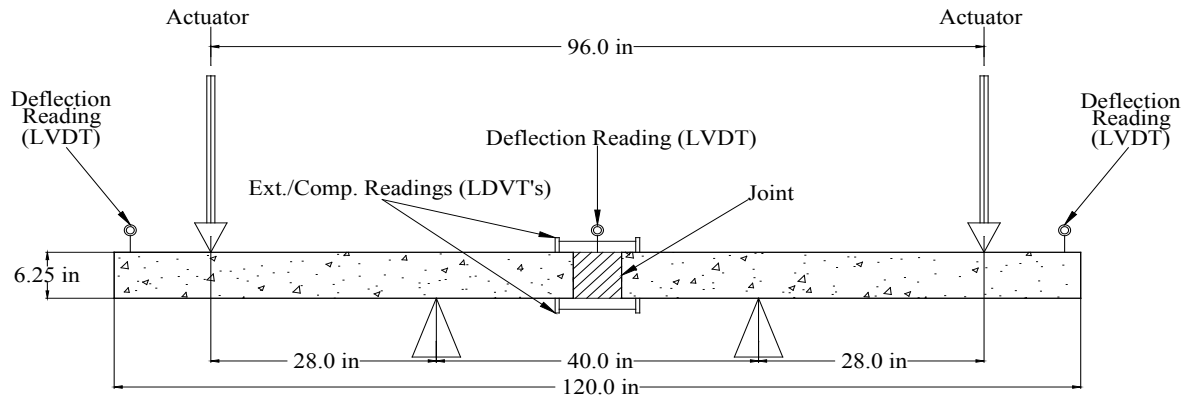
Flexural test set-up (Longitudinal Joint Test)
